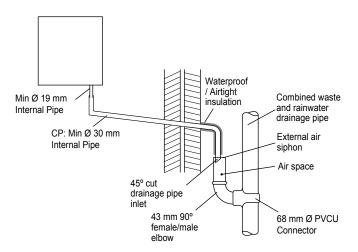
Connection of Condensation Drainage to Rainwater Pipe
